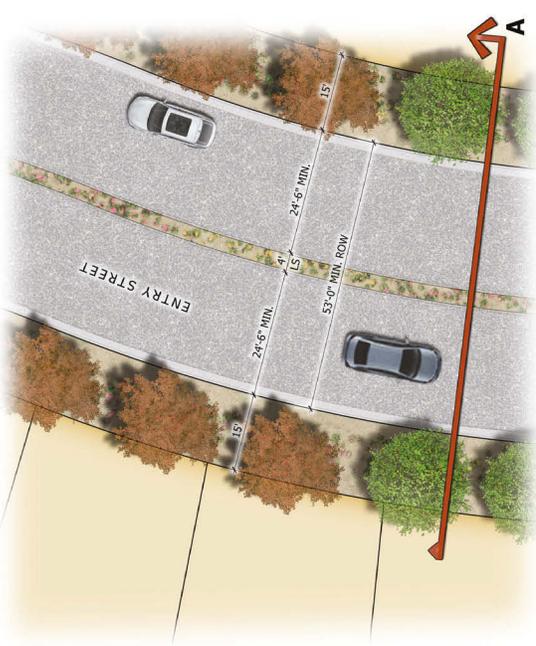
T.2: STREET SECTION - PRIVATE STREETS
